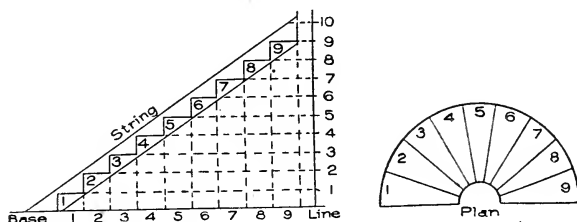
Plan of Circular Stair and Layout of Wall String for Same.
